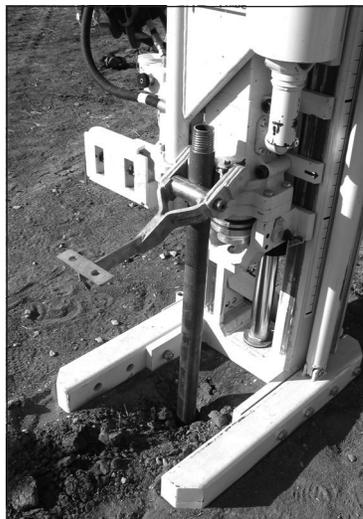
Outer casing may be retrieved with a pull cap or rod grip pull system if the probe hole is sealed with granular bentonite.
